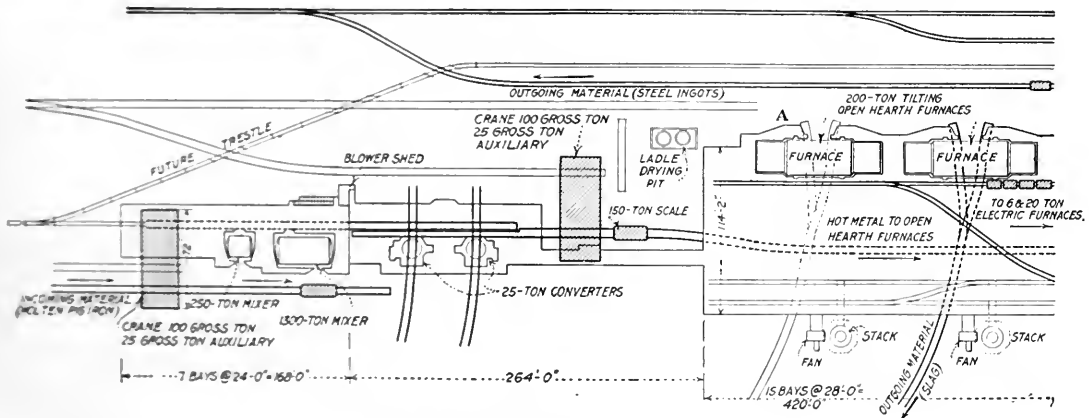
GENERAL PLAN OF DUPLEX PLANT
